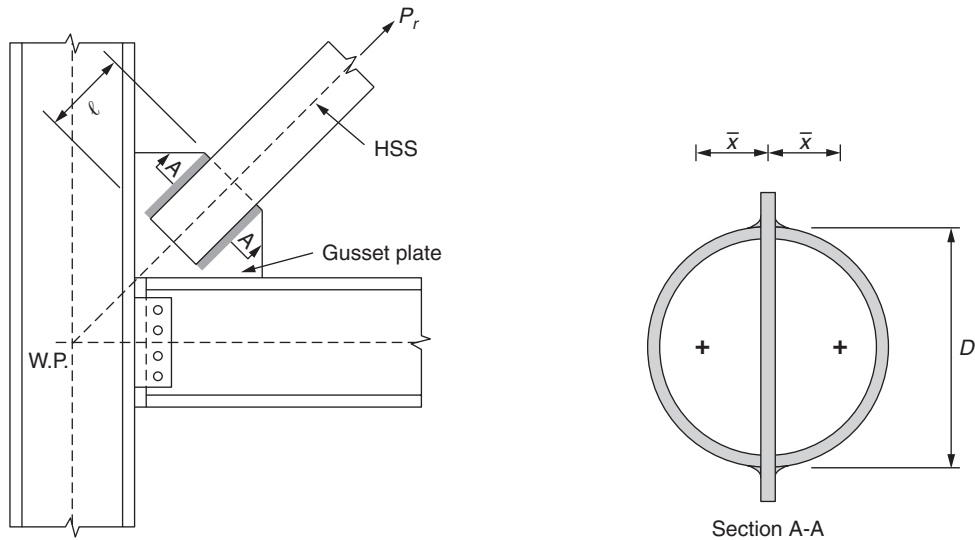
Welded connection for hollow structural section.
